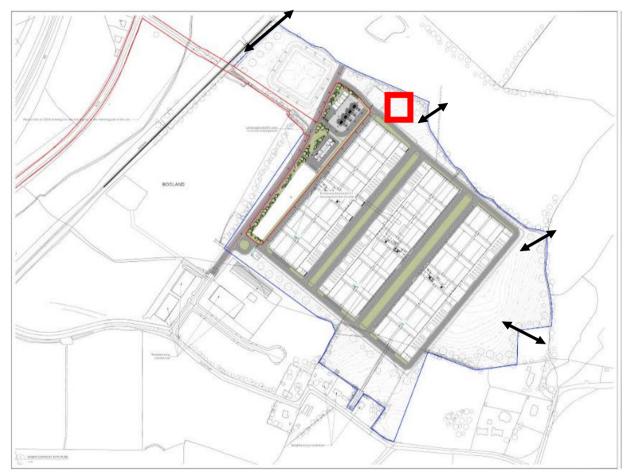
Badger access to site (see Proposed Site Masterplan DUB30-02-ZZZ-L00-DR-RAU-AR-1003
